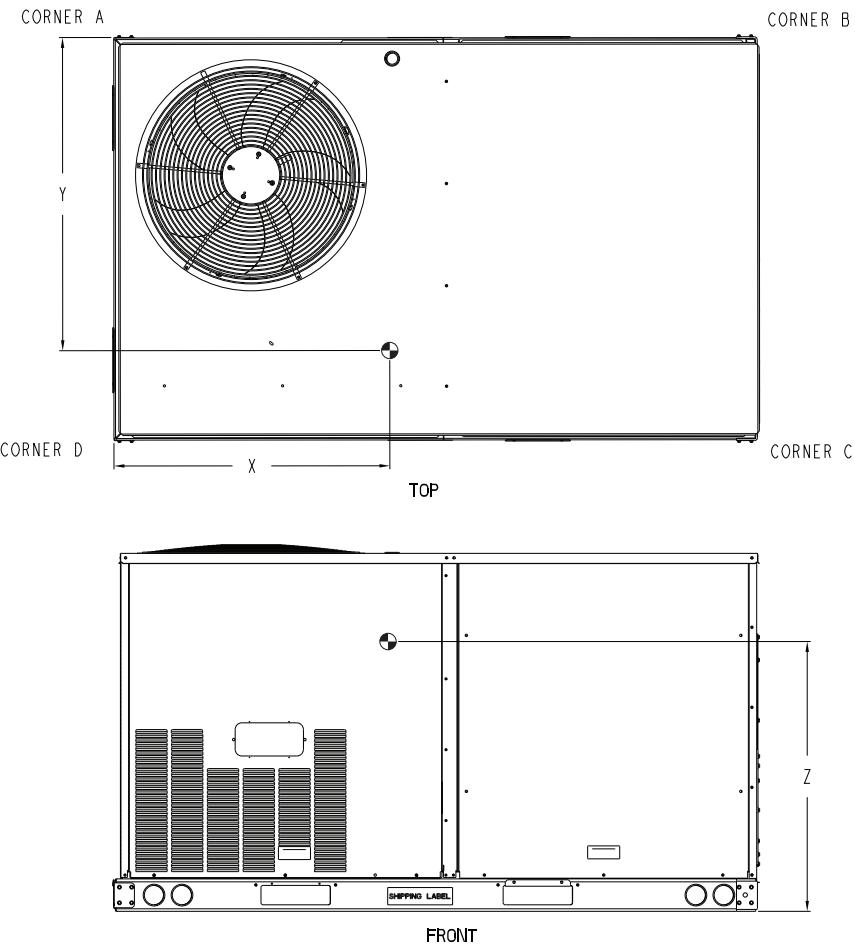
50JC 04-06 Unit Dimensional Drawing
